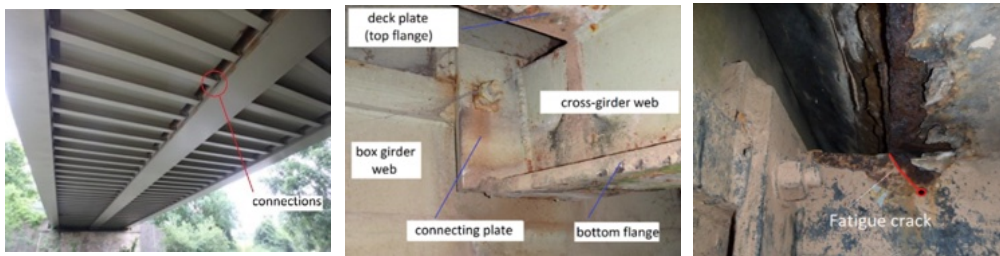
Detail of connection susceptible to fatigue cracking
